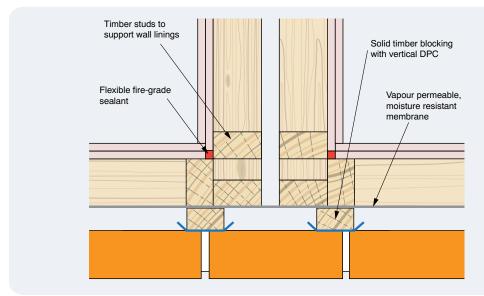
Double stud fire-protected timber internal wall intersecting a brick veneer wall with split cavity barrier system.
